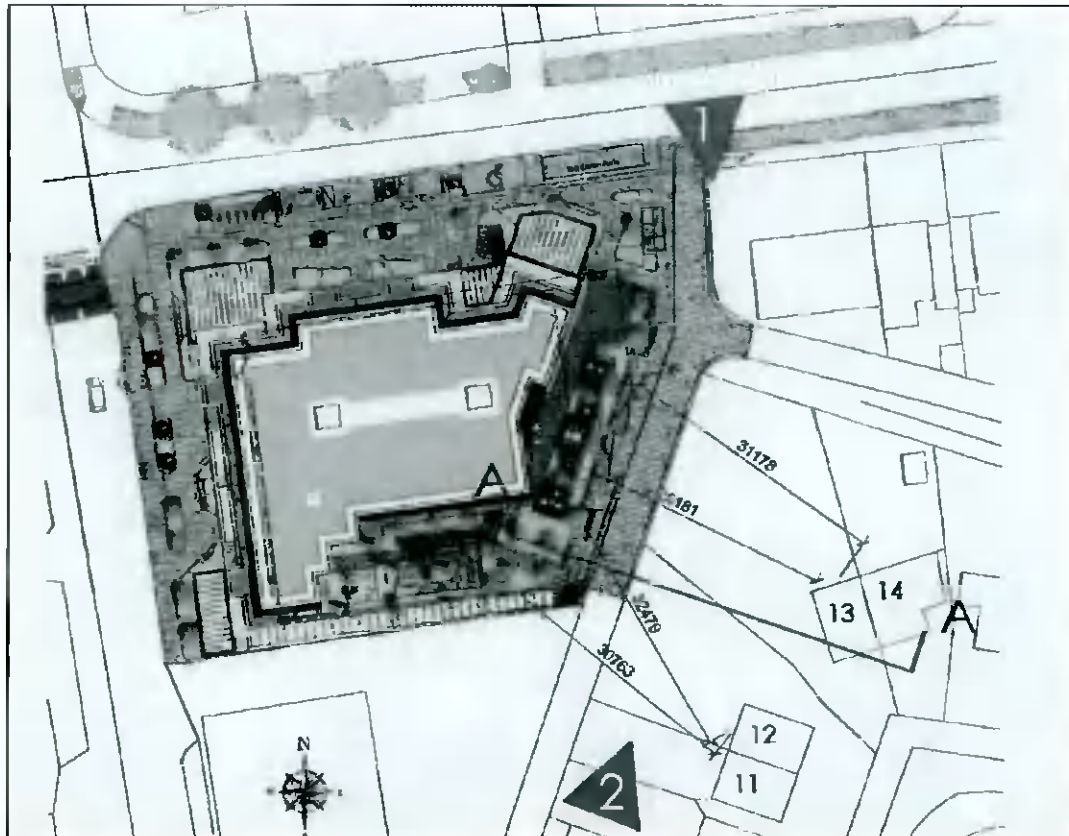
Proposed site layout plan showing separation distances between proposed development and existing dwelling southeast of the subject site (~30.8m and 36.2m)
